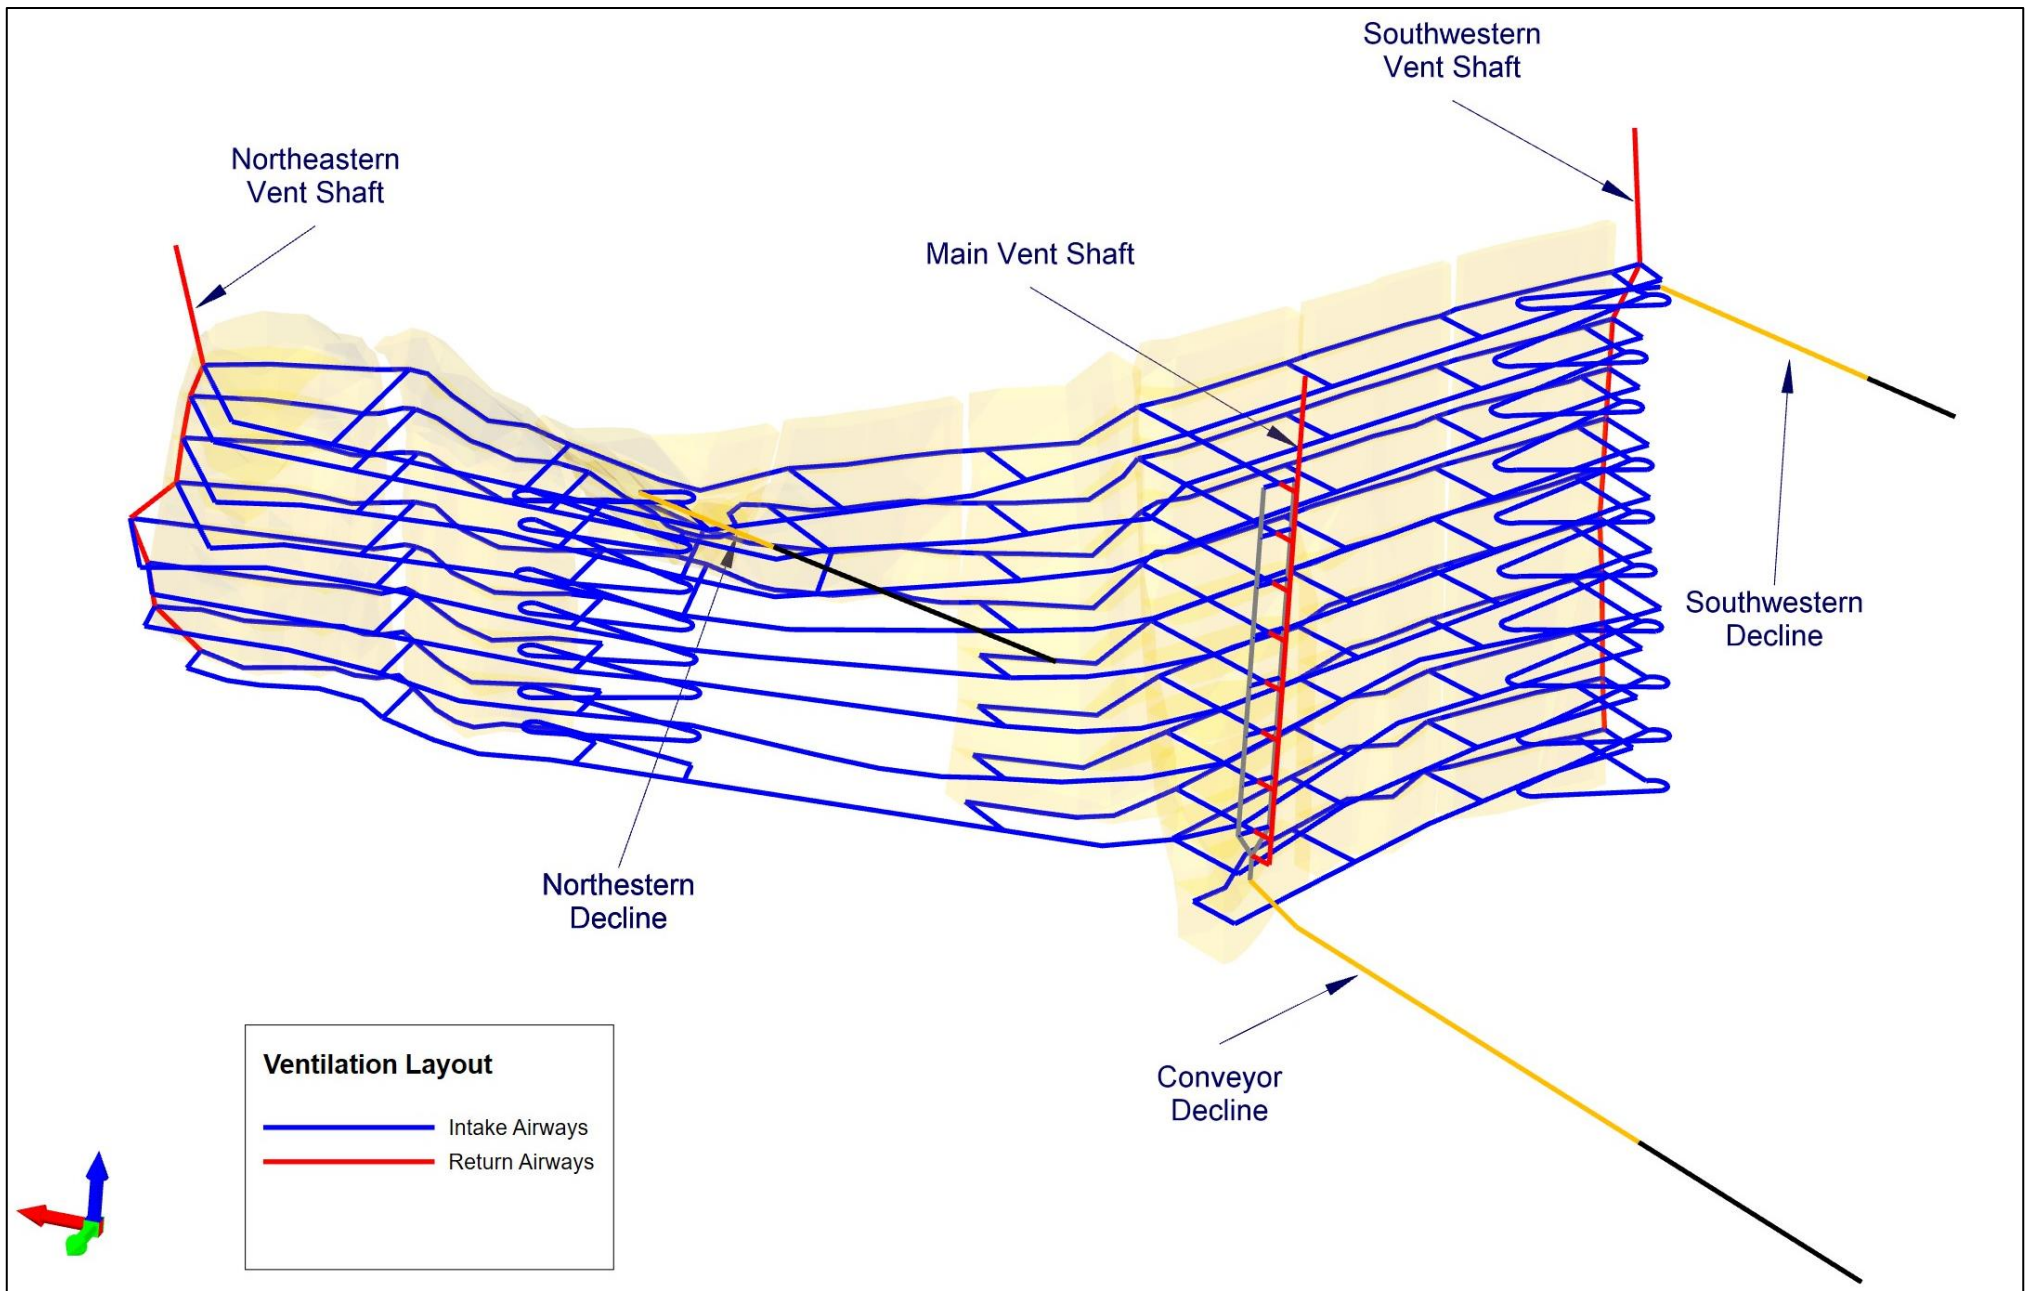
Ventilation layout for the proposed Elbe mine (Source: van Vuuren, 2020).
